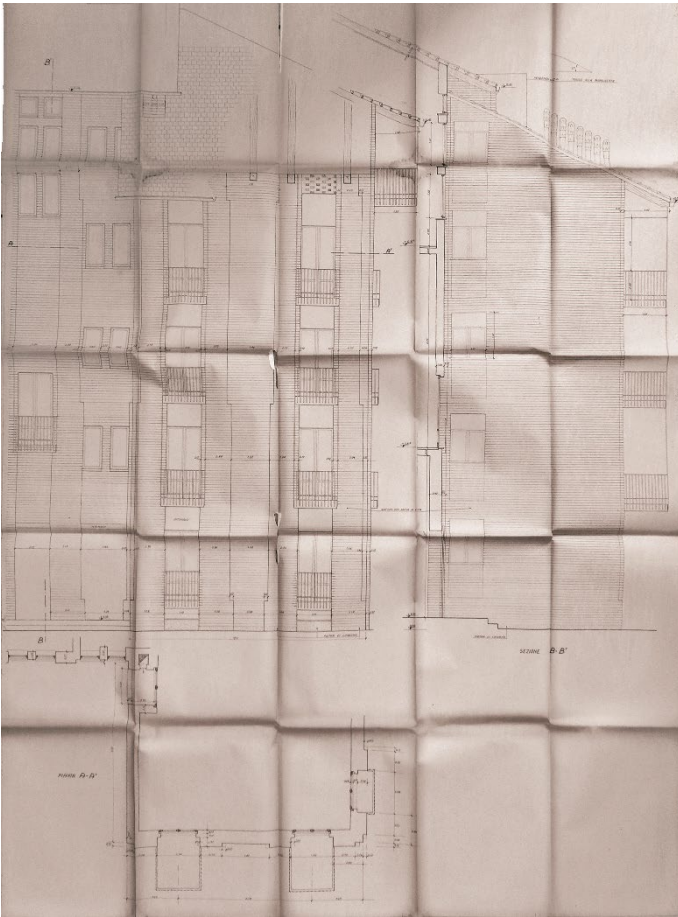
Detail drawing with the elevation of an H-shaped building with the system of tapered pilasters (1:10) (ATC, 14563).
